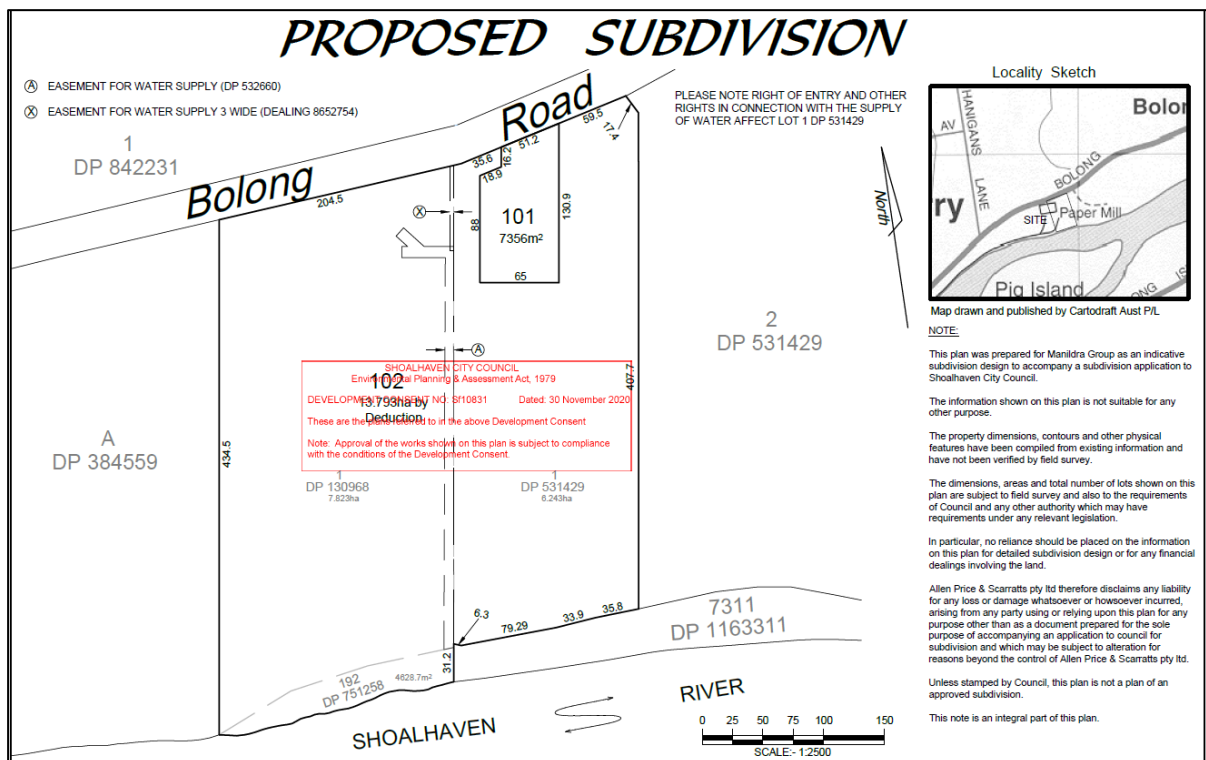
Approved Subdivision Plan SF10831 (Source: submitted subdivision plan prepared by AP&S)
